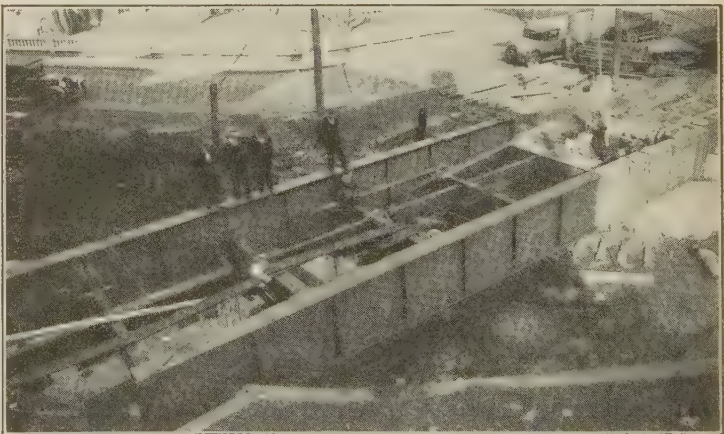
ALL ARC-WELDED RAILROAD BRIDGE OF THROUGH-GIRDER TYPE
